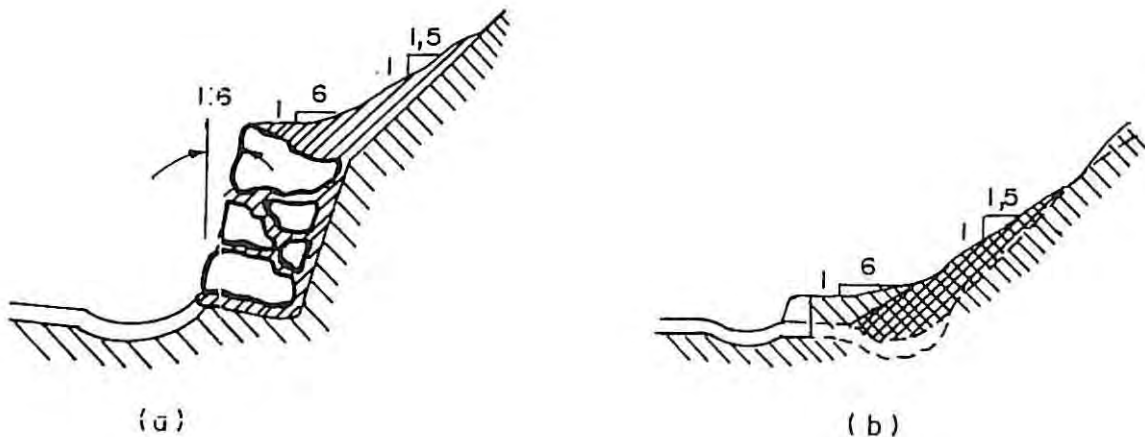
TYPICAL TOE PROTECTION MEASURES
